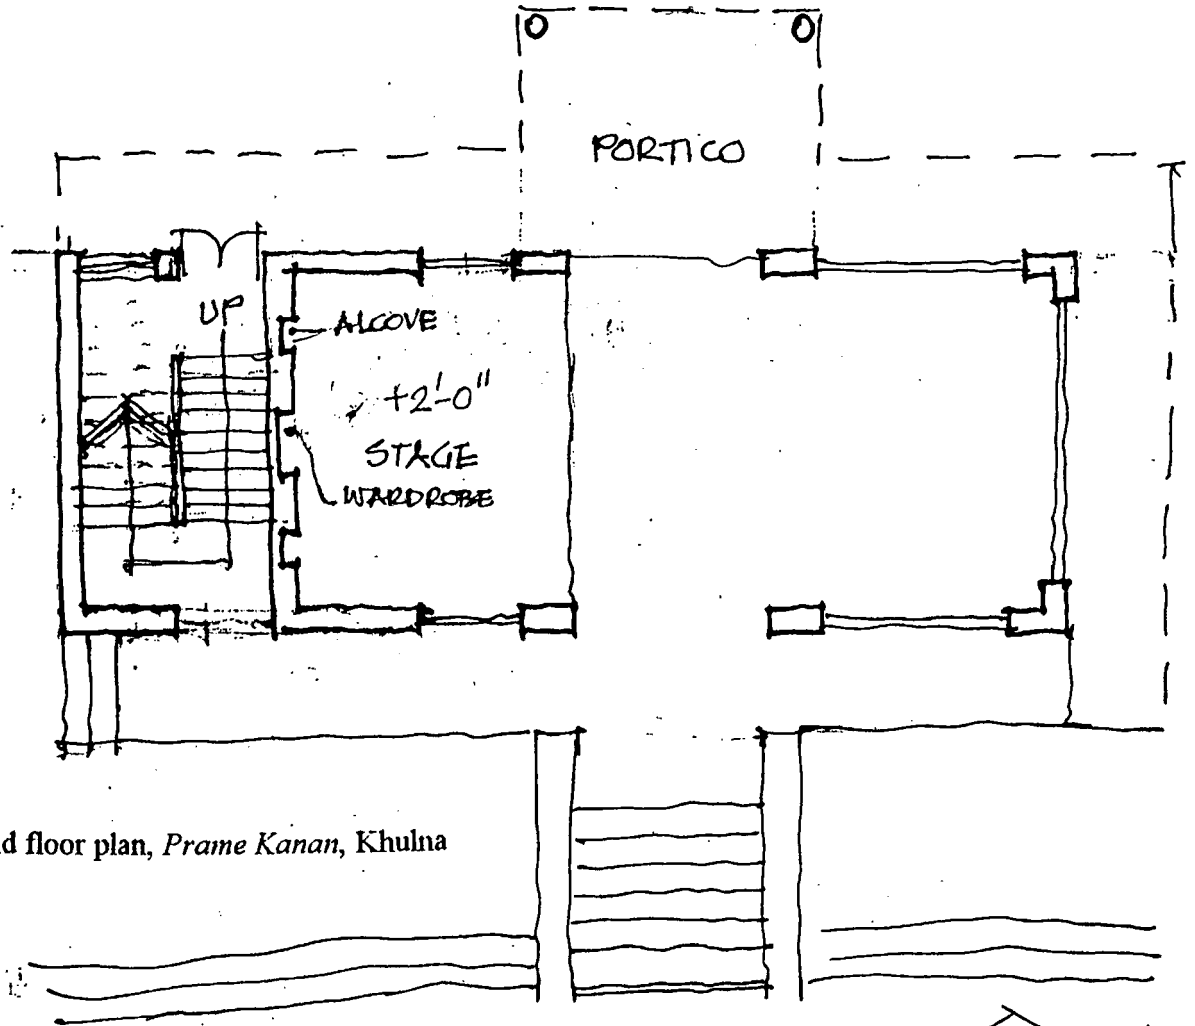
Ground floor plan, Prame Kanan, Khulna
